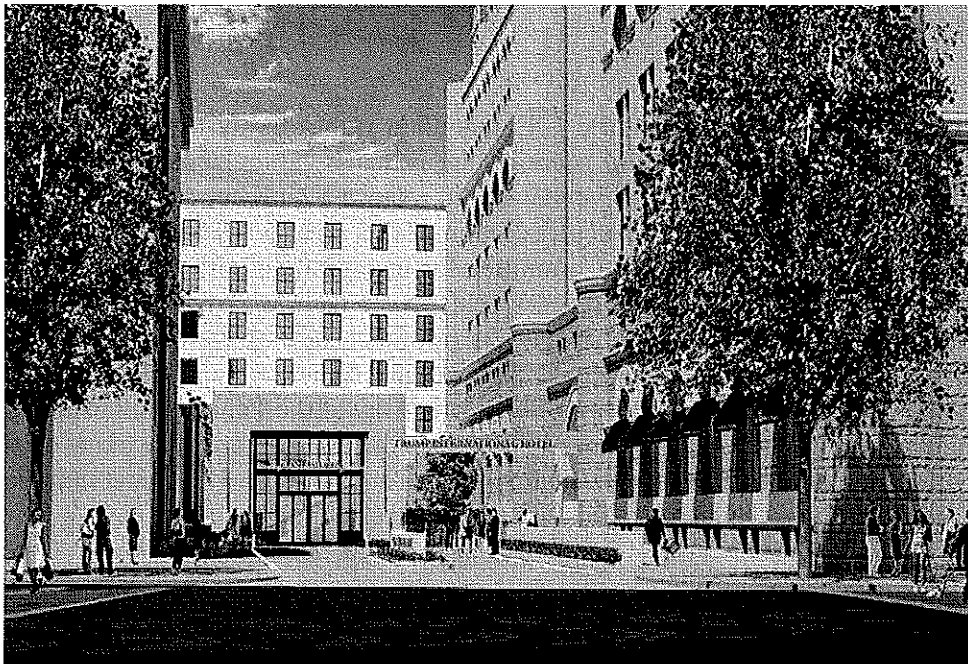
Renovation of Annex and 11<sup>th</sup> Street driveway
